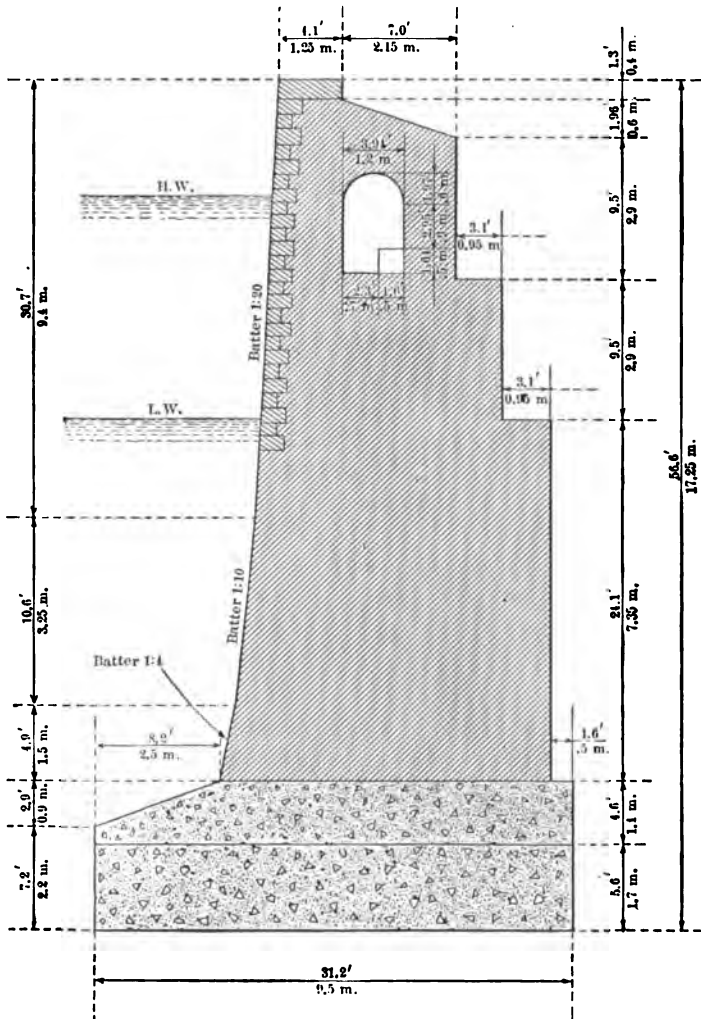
(a).—ANTWERP QUAY WALL SECTION.
